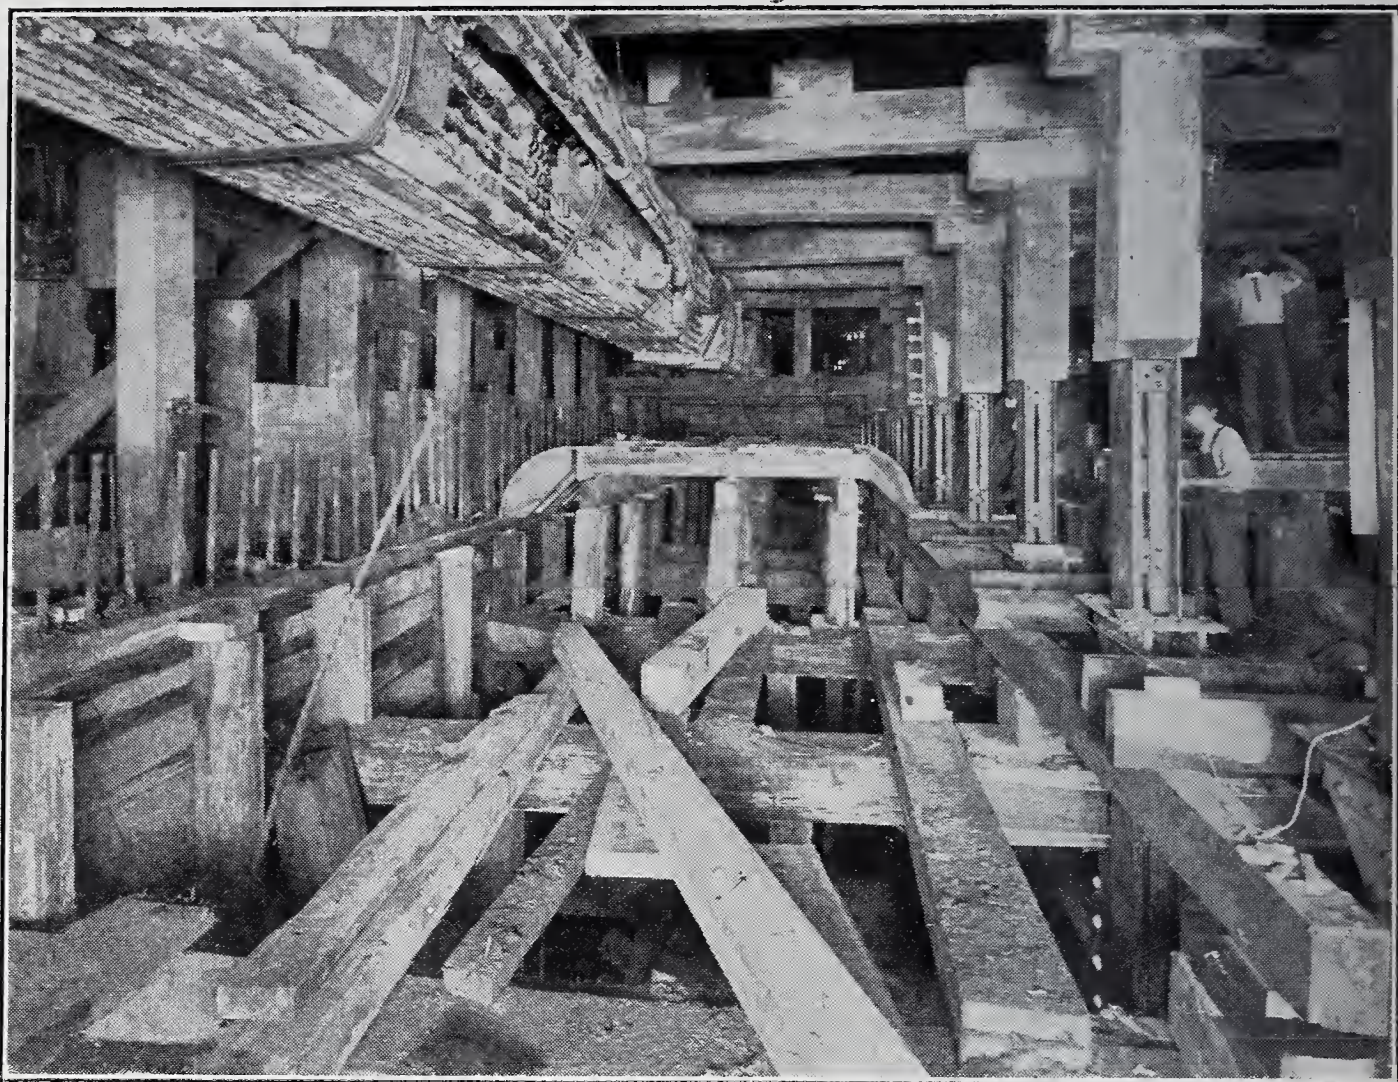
STANDARD SUBWAY. SHOWING ROOF FORMS IN PLACE AND METHOD OF TEMPORARILY UTILIZING CENTER COLUMNS OF SUBWAY TO SUPPORT SURFACE TRACKS.
